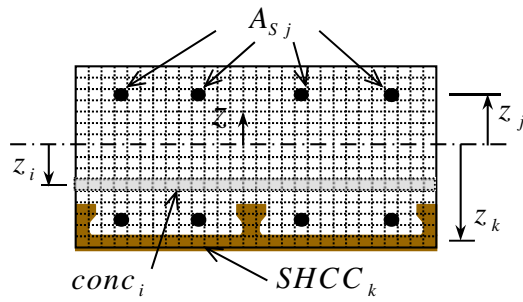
Sectional discretization of extruded SHCC and reinforced concrete slab
